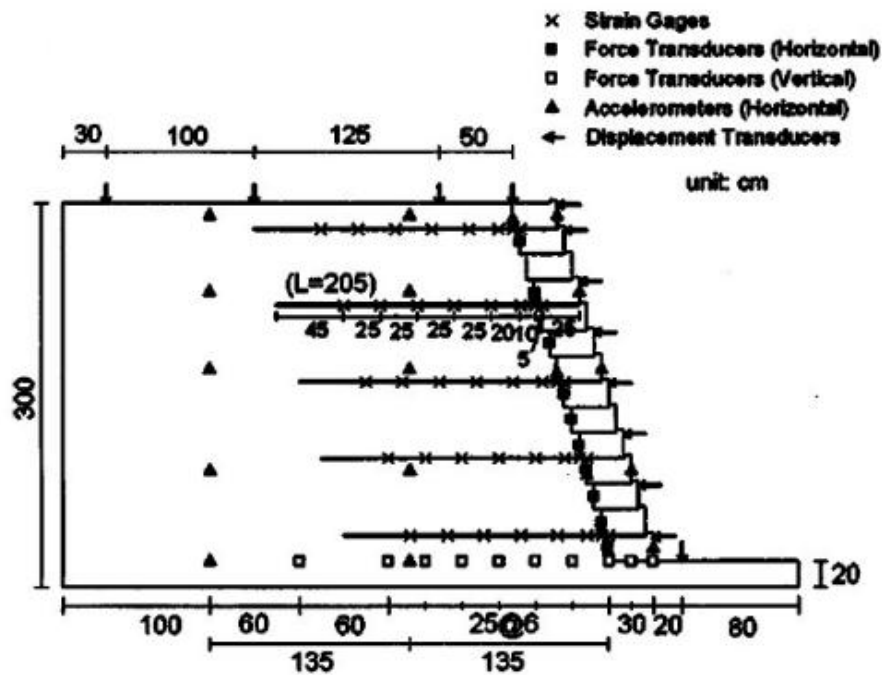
Cross-section instrumentation and layout of Wall 1 in full-scale shaking table tests (Ling et al. 2005a).
